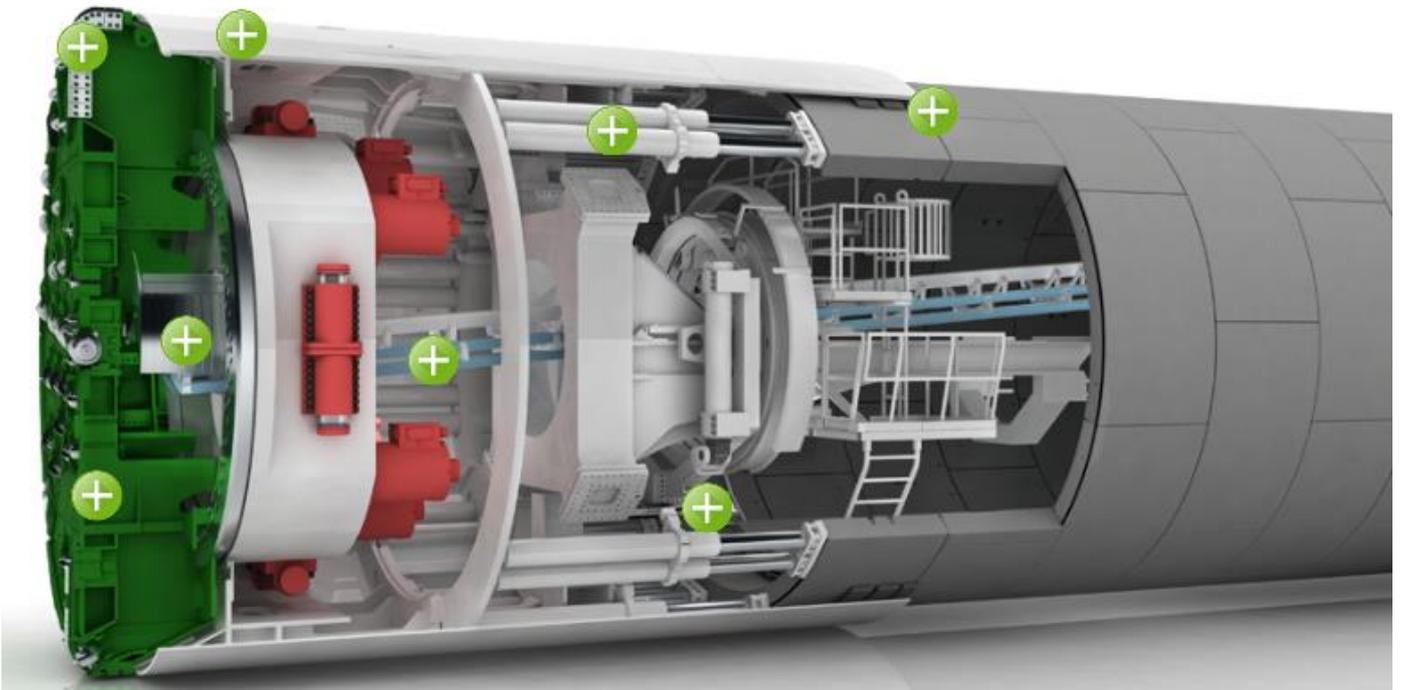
Shield-TBM with segmental lining (source: www.herrenknecht.com)
